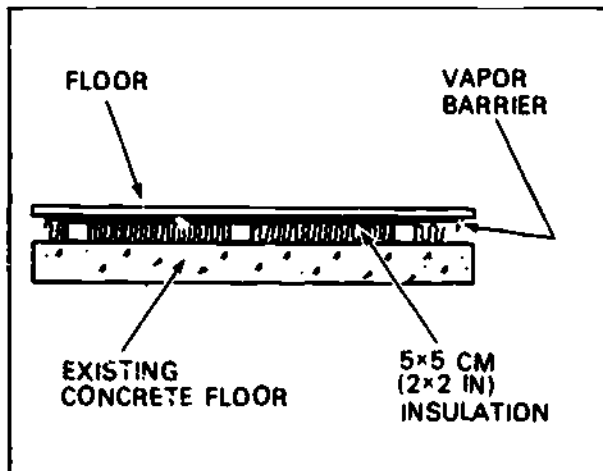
Install rigid insulation between vapor barrier and slab.
